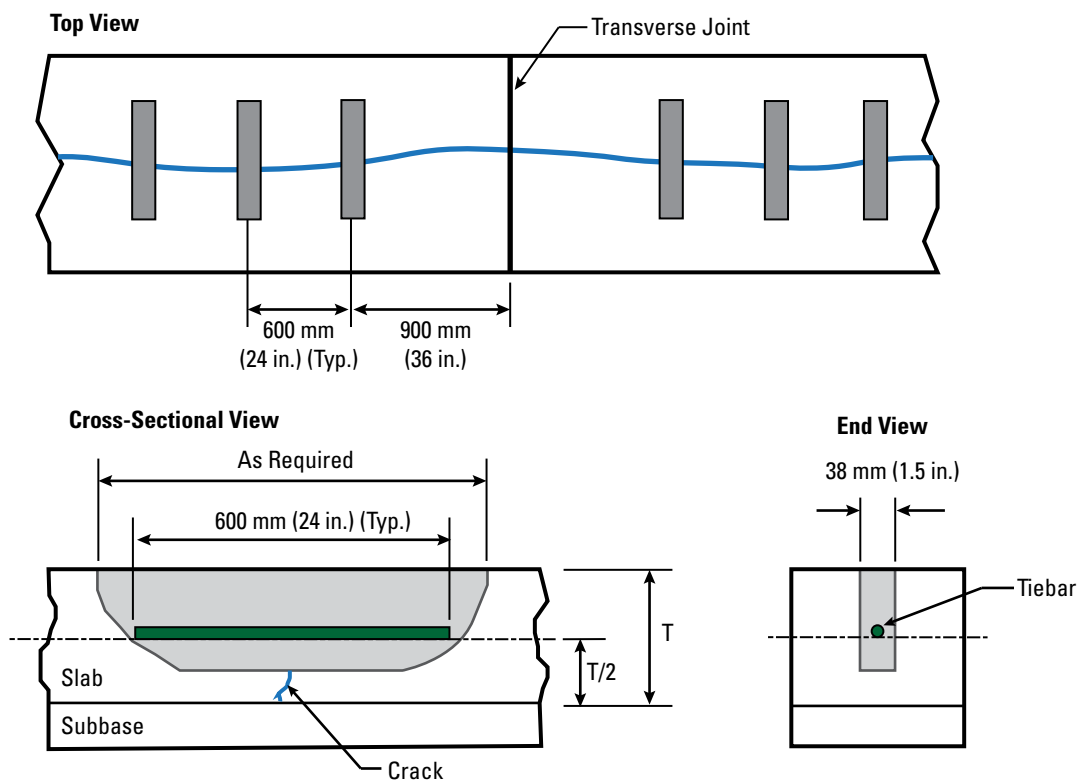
Schematic of slot stitching (adapted from IGGA [2010])
